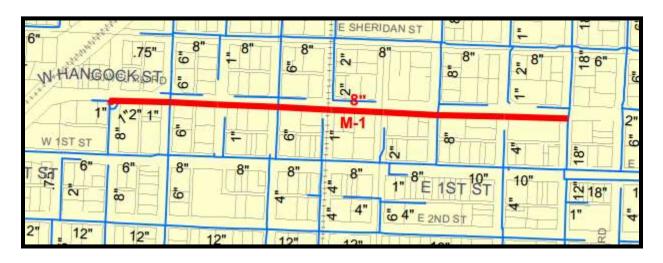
REPLACING DEFICIENT PIPE AND INADEQUATE FIRE HYDRANTS ON HANCOCK STREET
